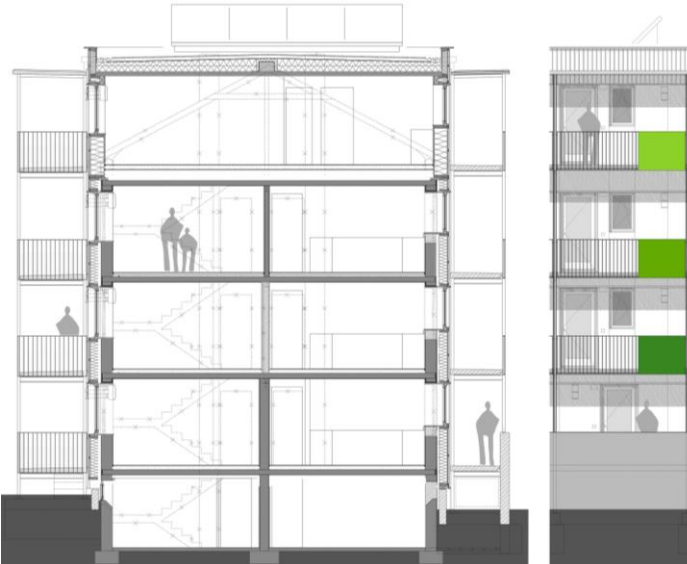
| Technological Detail of the deep renovation project for one of the Sendling PED buildings in Munich. Source: Hermann Kaufmann + Partner | Schwarzach, Lichtblau Architekten | München and E2ReBuild Project
